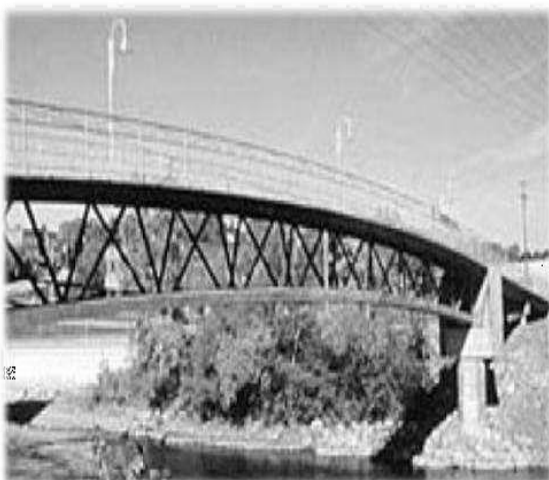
BRIDGE MADE OF HIGH PERFORMANCE CONCRETE
